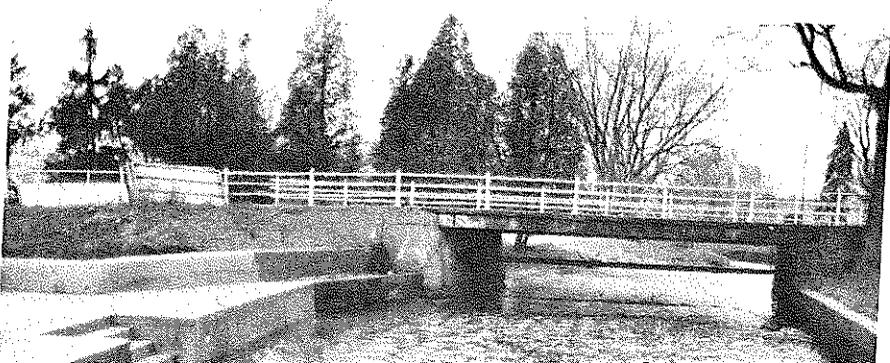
LOOKING UPSTREAM TO GORE STREET BRIDGE
